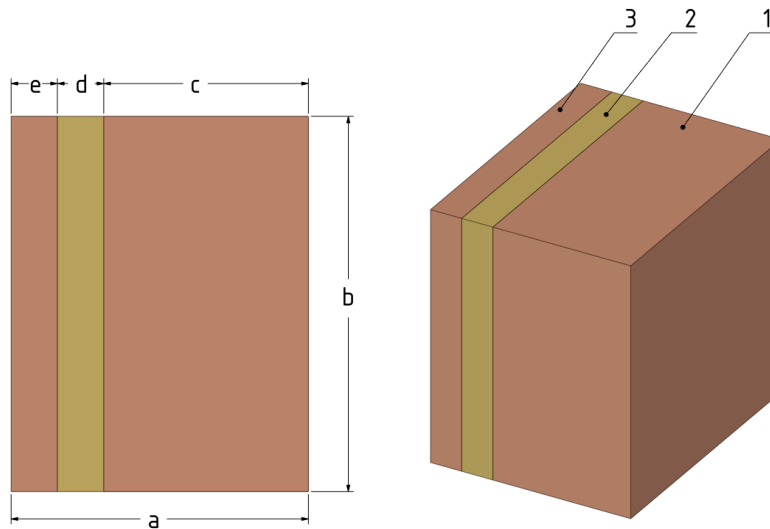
General view of a 3D model of a three-layer wall (option 2): thickness (a); height (b); bearing layer (c); insulation layer (d); facing layer (e); bearing layer material (1) — masonry; insulation layer material (2) — gypsum concrete (type 3); facing layer material (3) — masonry
